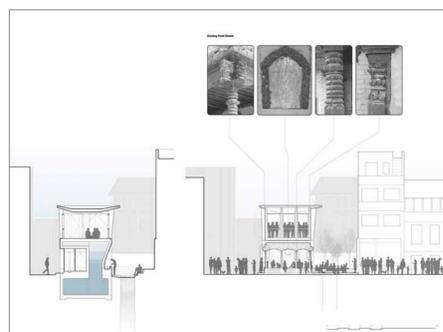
Section of the water system. Elevation showing details of the Paati connecting to public space.
